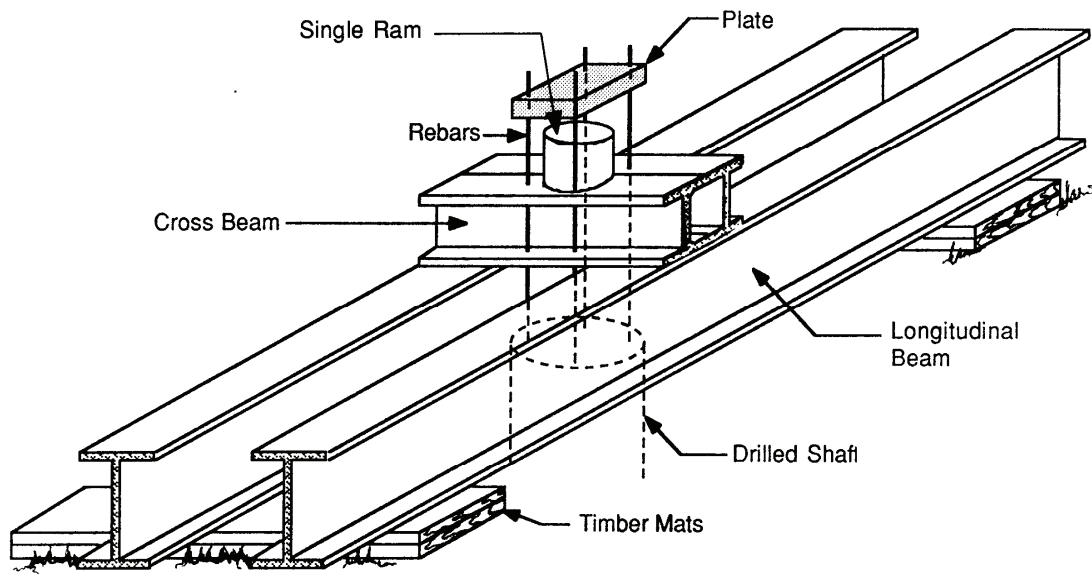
Arrangement for Testing a Drilled Shaft under Uplift Loading
